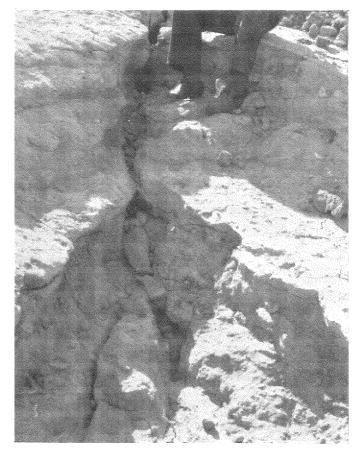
Scour and cracking in main dam downstream from 340 berm, January 4, 1964.
